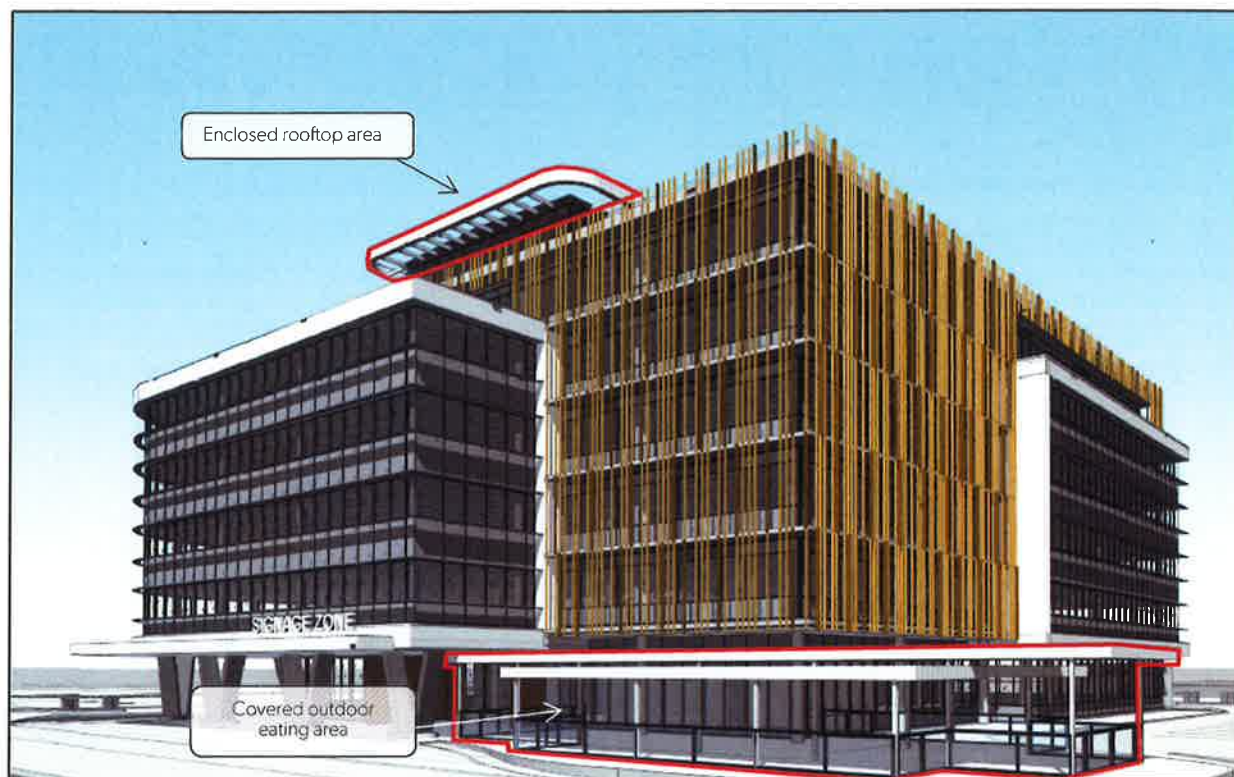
| 3D model of the Private Hospital showing the enclosed rooftop area viewed from the north west (Source: Application documents)
